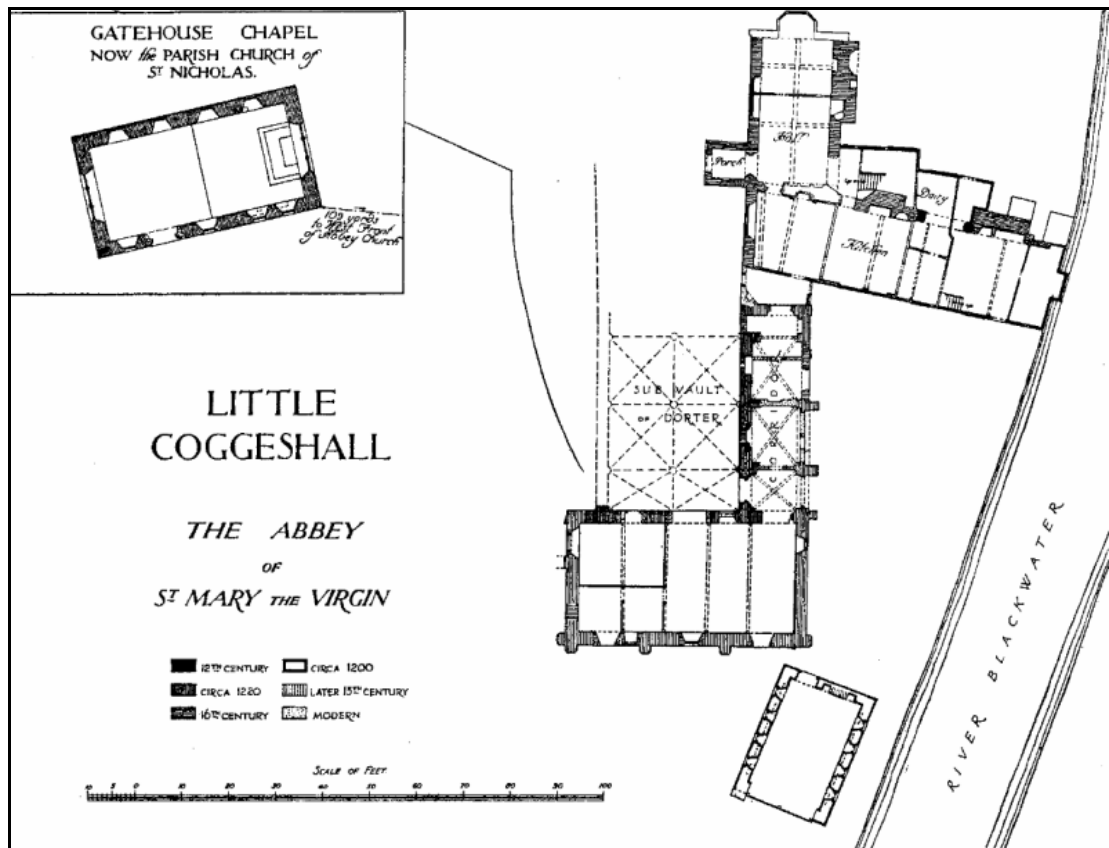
Plan of the surviving abbey/manorial complex (RCHME, 1922, 166).
